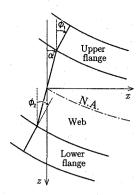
Typical sectional deformation of PC girder with corrugated web and assumed rotations
